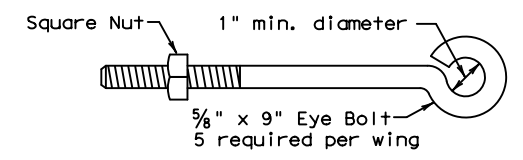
DETAIL OF GATE HINGE BOLT ASSEMBLY
